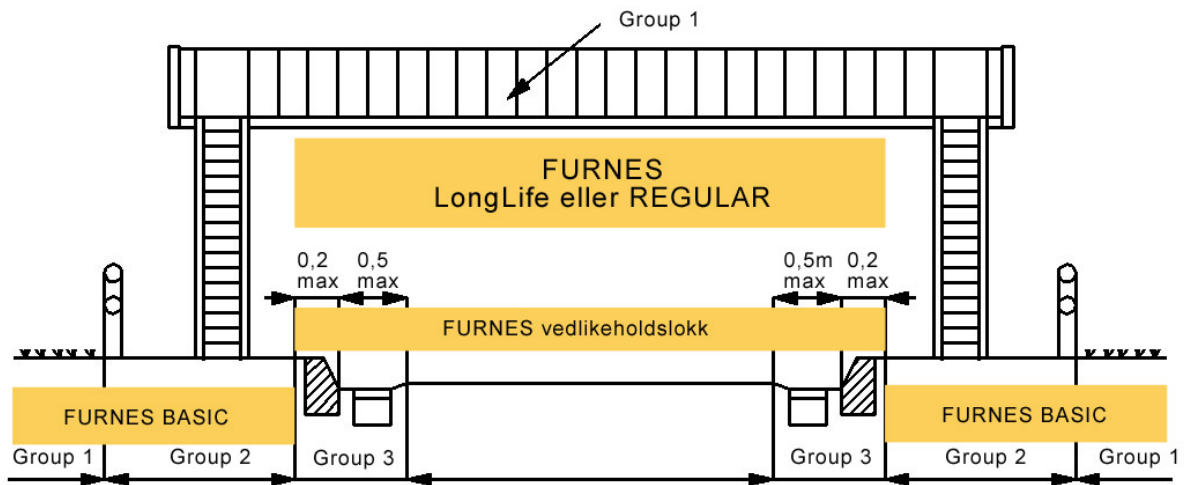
(EN124): Typical highway cross-section showing the location of some installation groups
